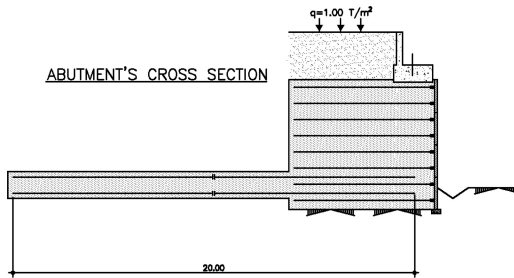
Caption of an abutment's cross section. Focus on two (20 m. long) metallic reinforcement layers added.
